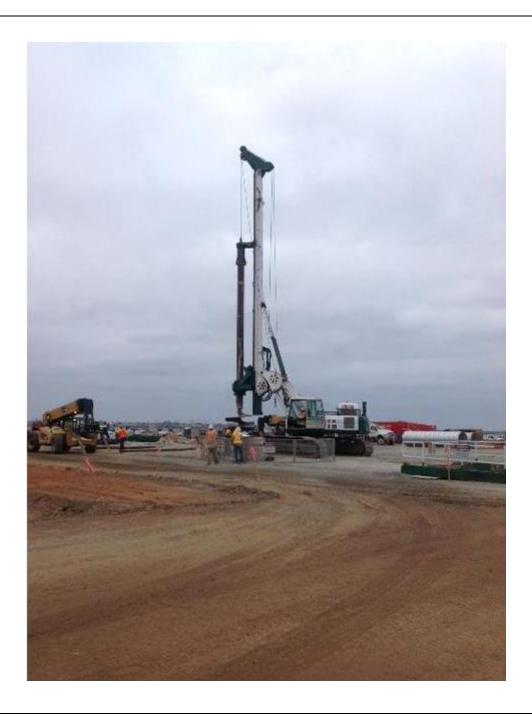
Drilling for tower foundations at the Bay Boulevard Substation. Monitors were observed on site during initial disturbance in accordance with MM-CUL-01 and APM-CUL-05, as applicable.
